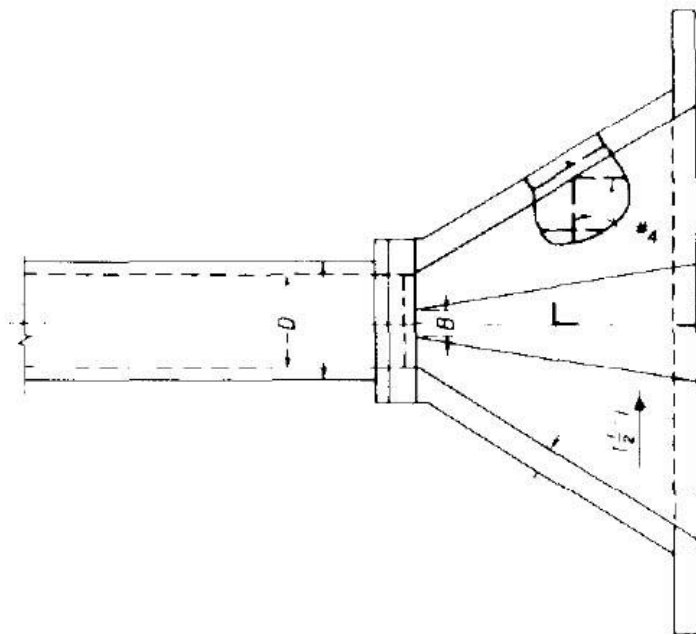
Typical Concrete Outlet Structure (Plan)
